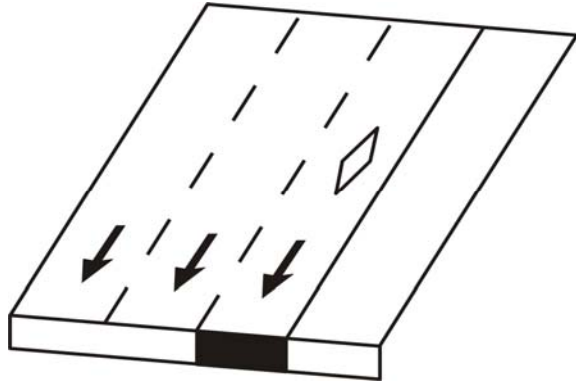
Reversible Barrier-Separated HOV Facility (Two Lane).
